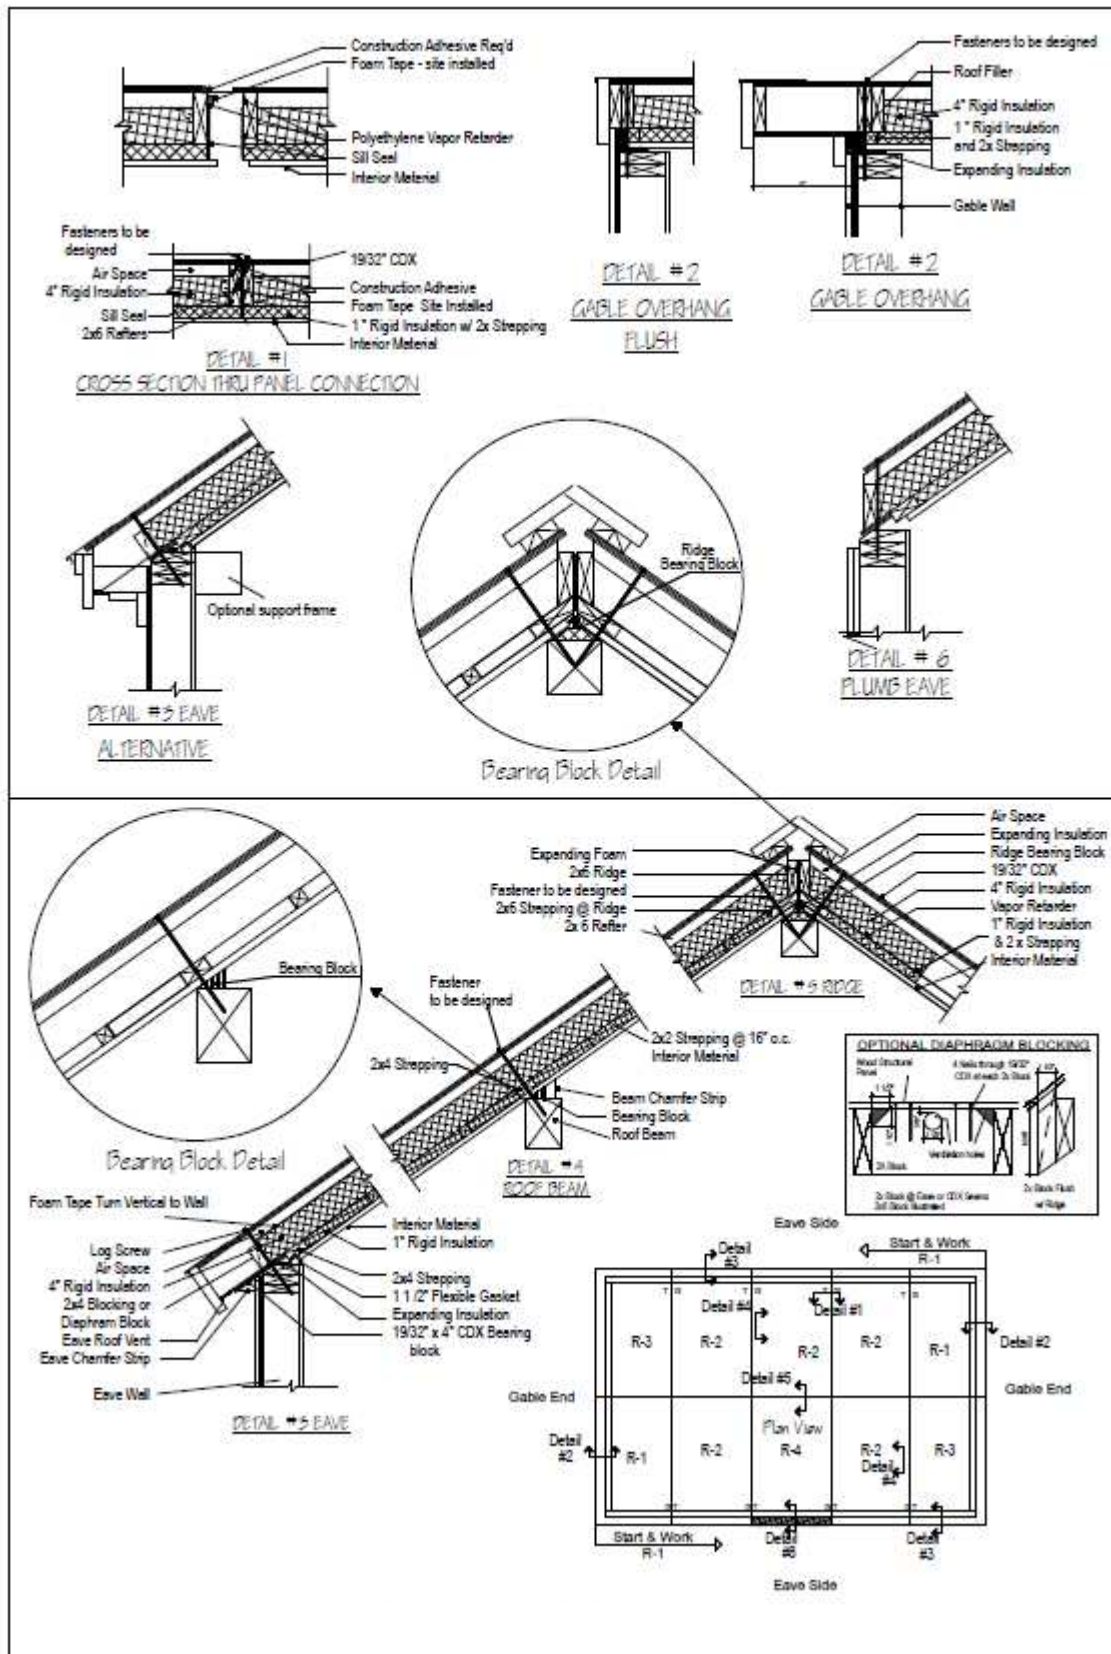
TRUE ROOF PANELS INSTALLATION DETAILS (Continued)
